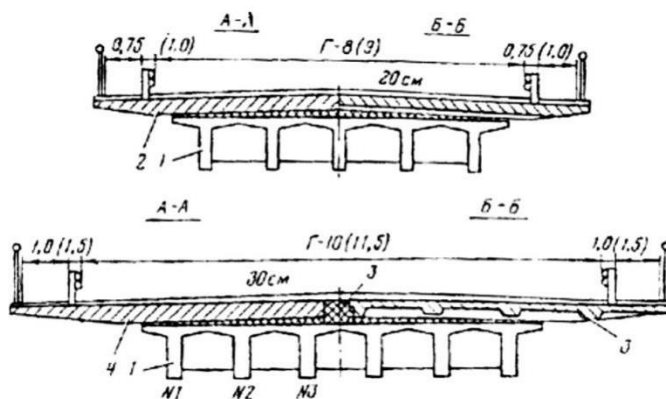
The schemes of widening the cast and (a) and precast with cast-in-place (b, a) attachable slab:
